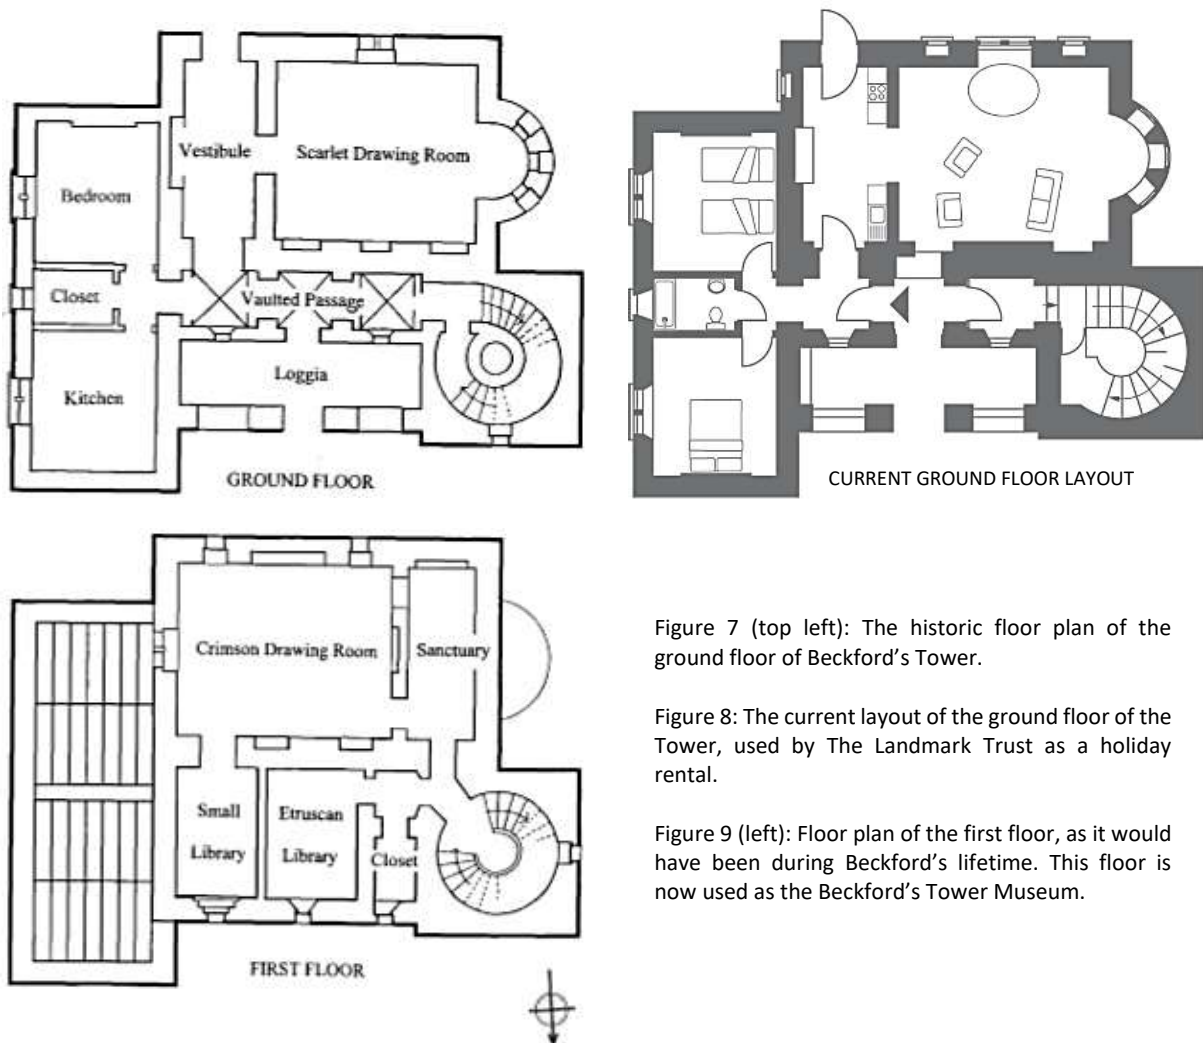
(top left): The historic floor plan of the ground floor of Beckford's Tower.
